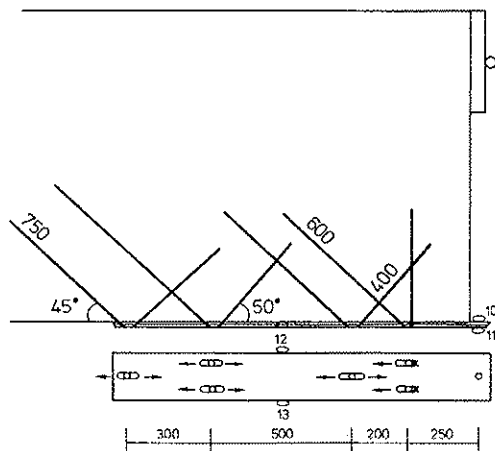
Spacing of the rods in the connections of asymmetric beam 4. Maximum normal force N_{max} in the connection was 1380 kN.
